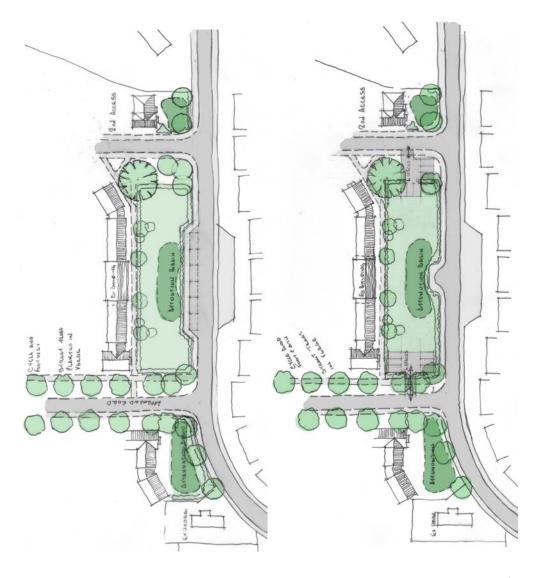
Potential parking options, with layby parking to Fox Crescent and/or parking courts located close to the site entrance from Fox Crescent.
